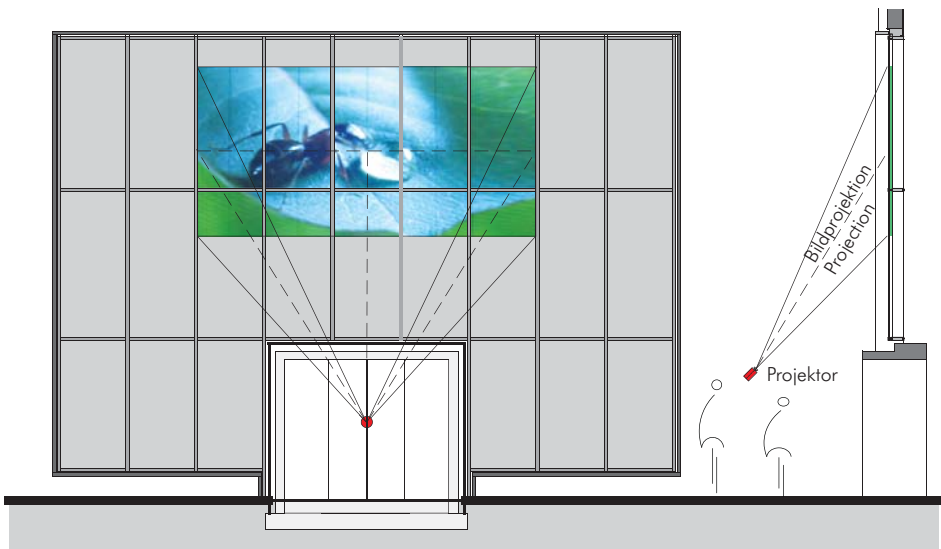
Media façade of Sparkasse Hanau, DE, Arch.: Baudisch und Partner, Hanau, Germany.
